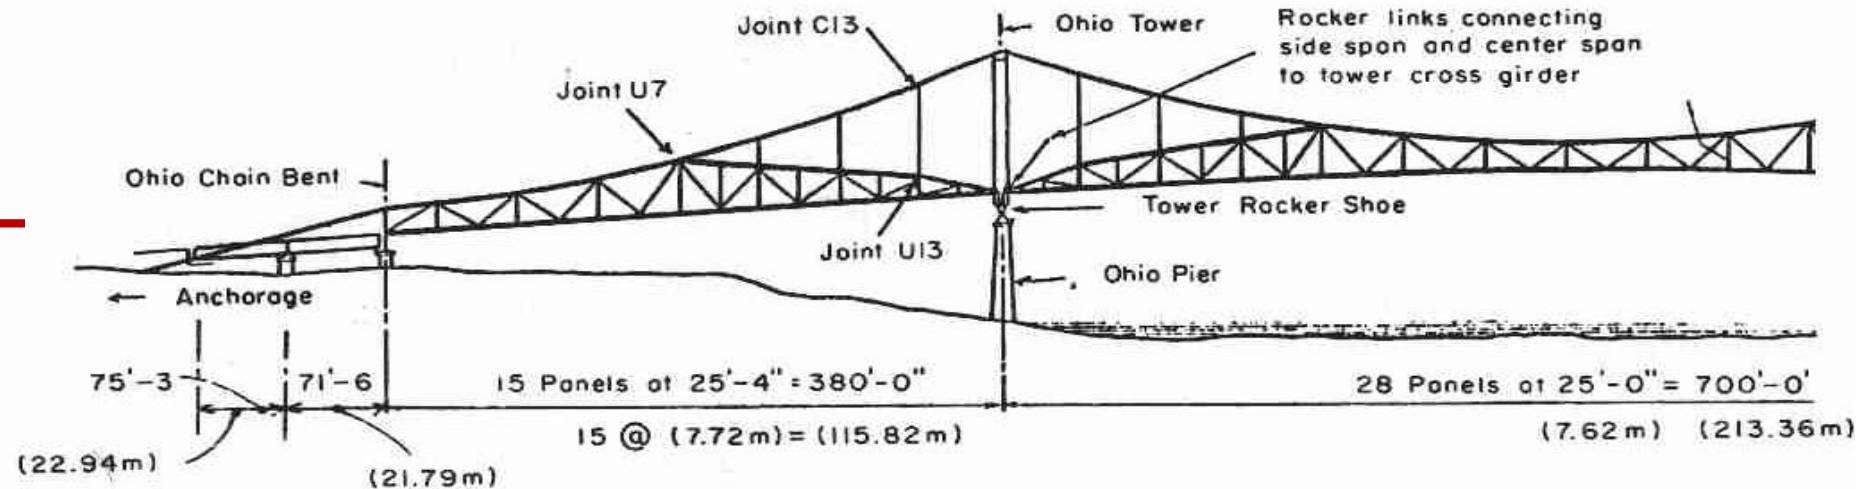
Elevation of Point Pleasant Bridge showing location of joints C13, U7, and U13.
